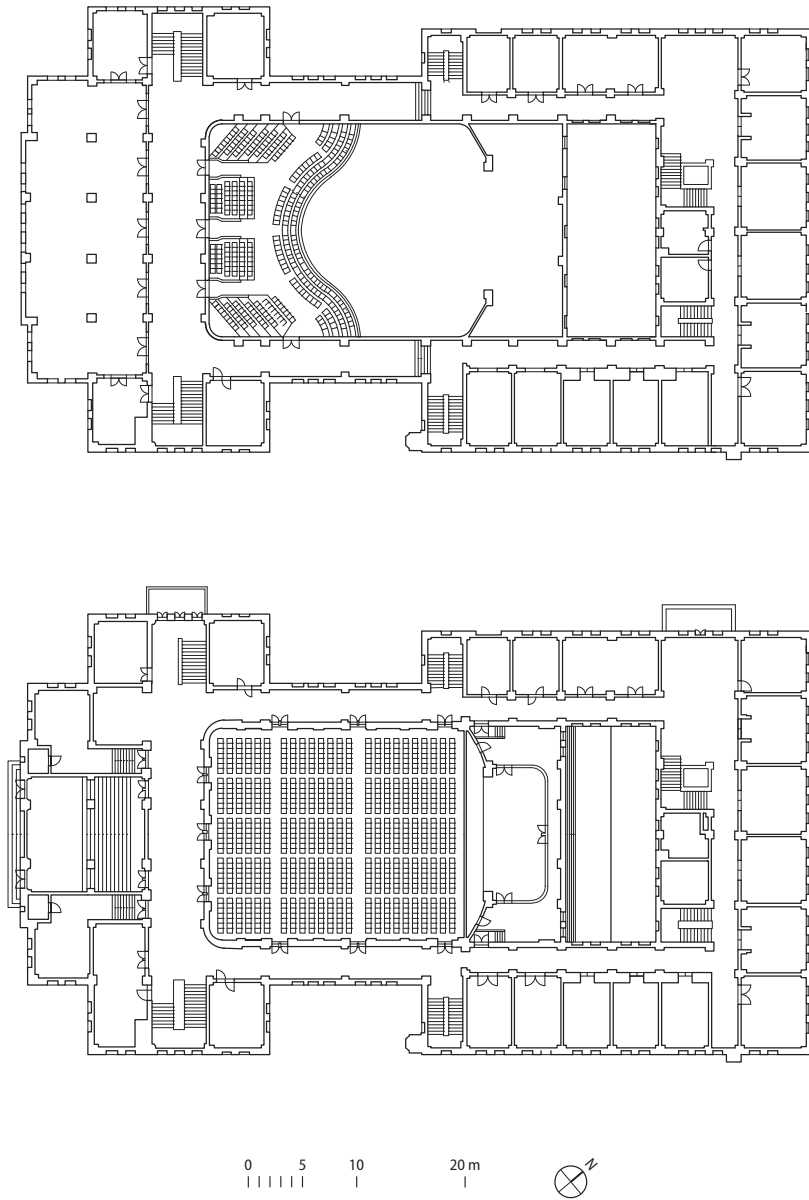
Ground floor (bottom) and first floor (top) plan of the Nihon Seinenkan, A longitudinal section of the original state of construction with two balconies could not be found. Scale = 1:700.
